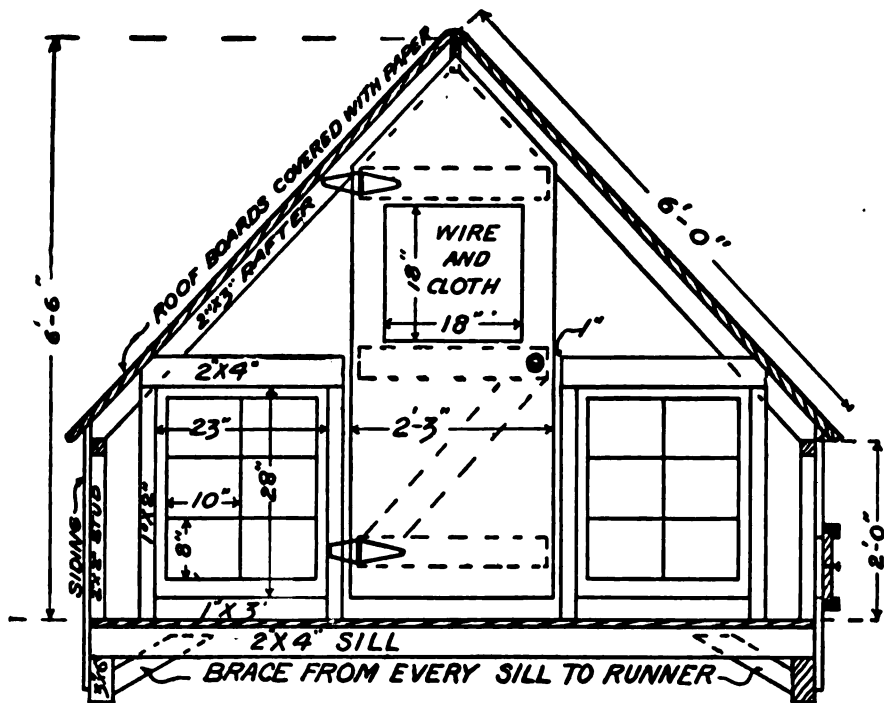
Cross-section plan of the colony brooder-house. Note size and position of windows and door, rafters and roof, and sills and runners
